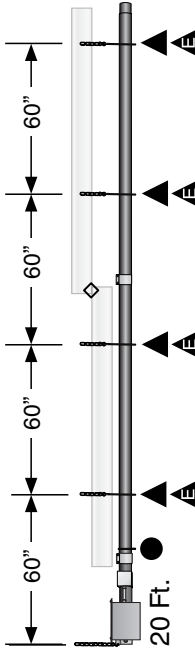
• Heater Suspension Layout • Five (5) Foot Truss Mounts
